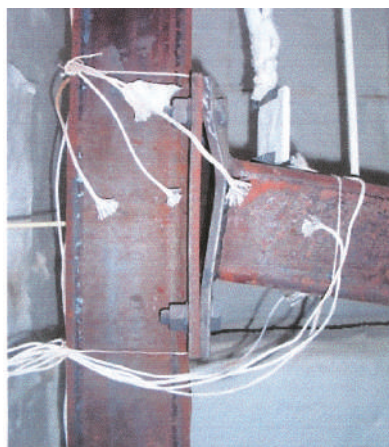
Placement of reinforcing plates for W12 × 19 beams to be tested under load (courtesy of Professor Yi Liu).
